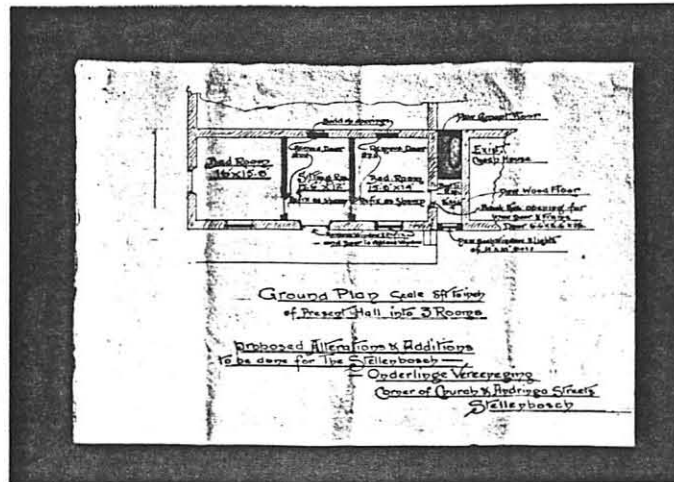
An undated plan (plot 1298, no 79) of c.1910, details plans for the reconstruction of rooms A, B and C (Stellenbosch Municipality).
